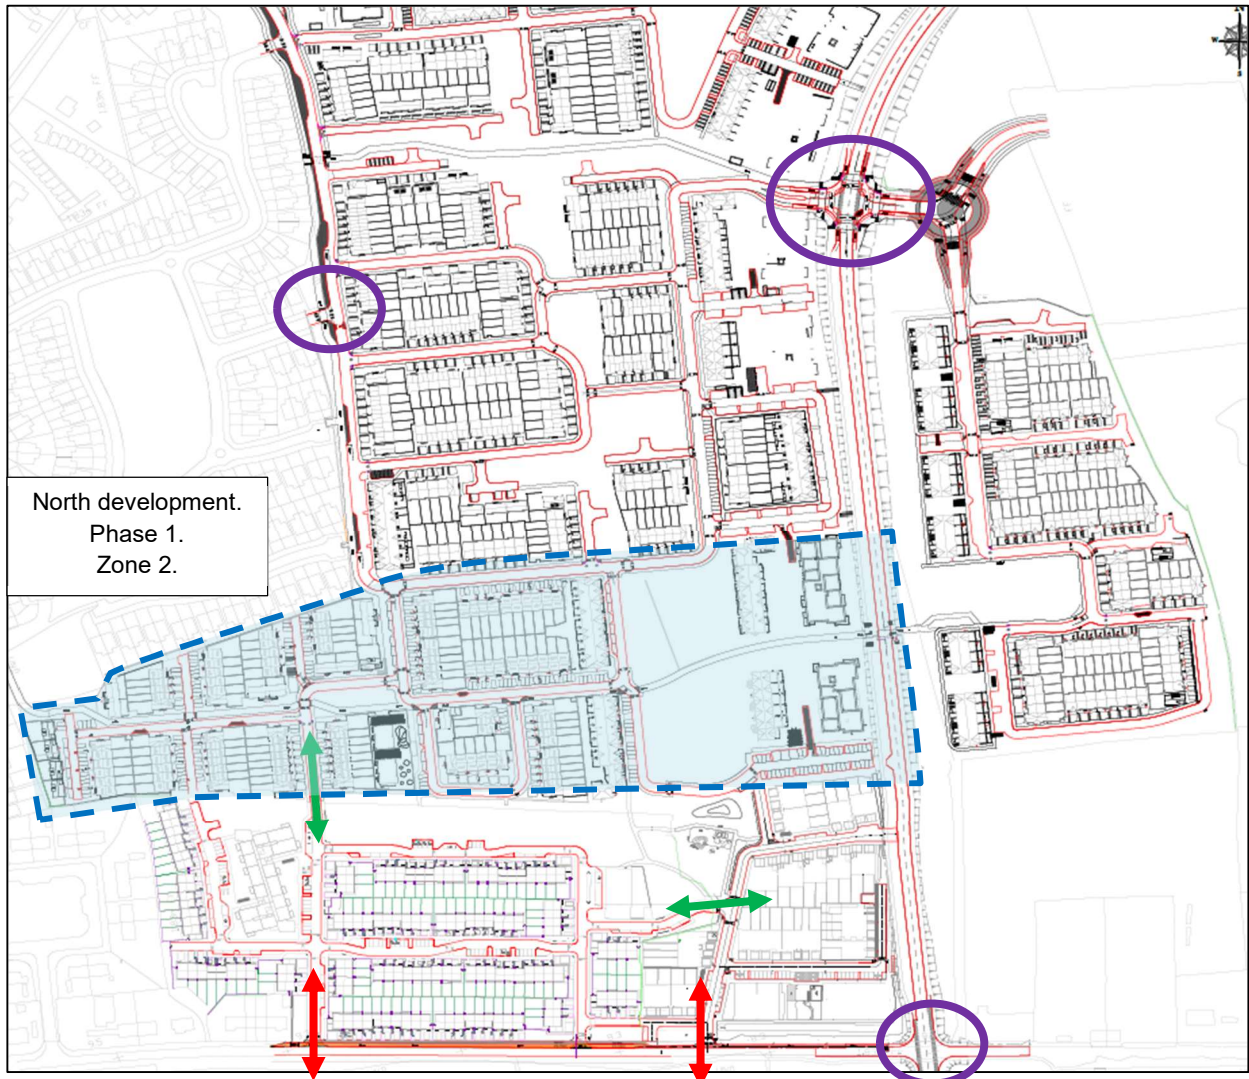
| Site Location - Detail (Source: Openstreetmap)
